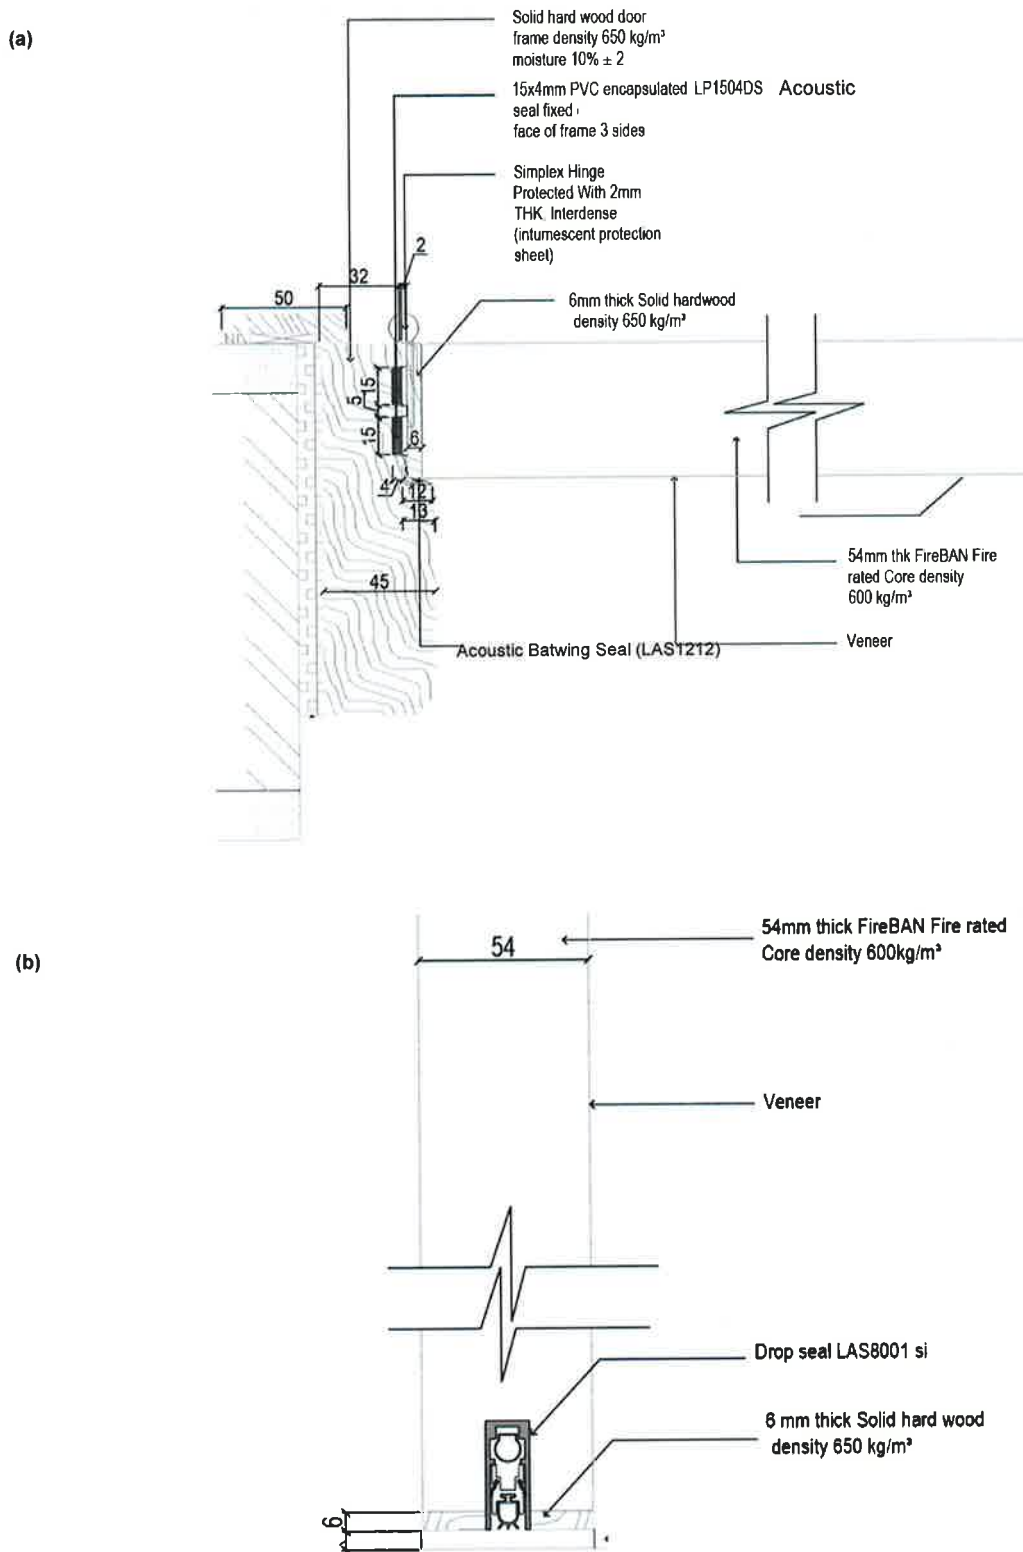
(a) Top view of hinge side fixing details of FD60 door frame and leaf (b) Side view of bottom section FD60 door leaf
